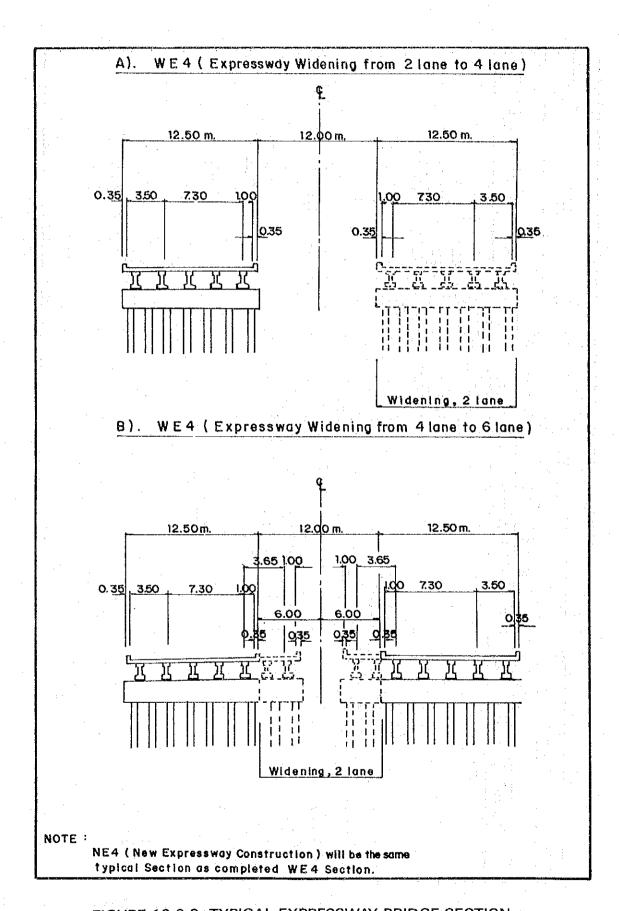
TYPICAL EXPRESSWAY BRIDGE SECTION
